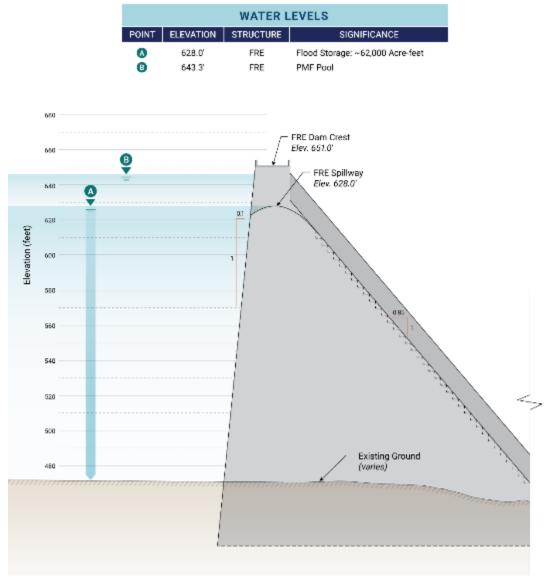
Hydraulic Design Criteria for FRE Typical Section
